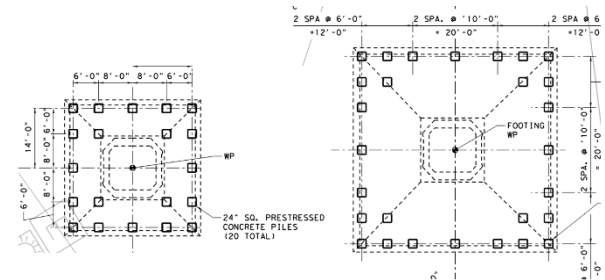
Back span pier foundation (left) and transition pier foundation (right).
